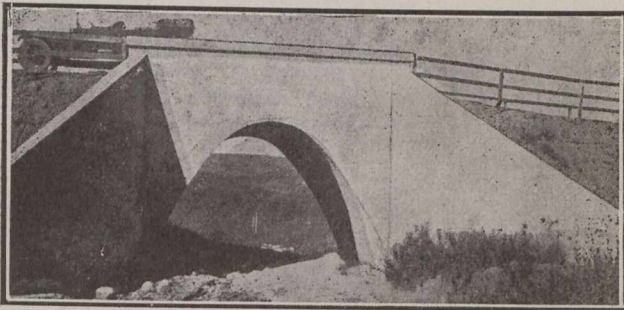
A 20-foot Concrete Span Over Gibson Creek, Sask.
